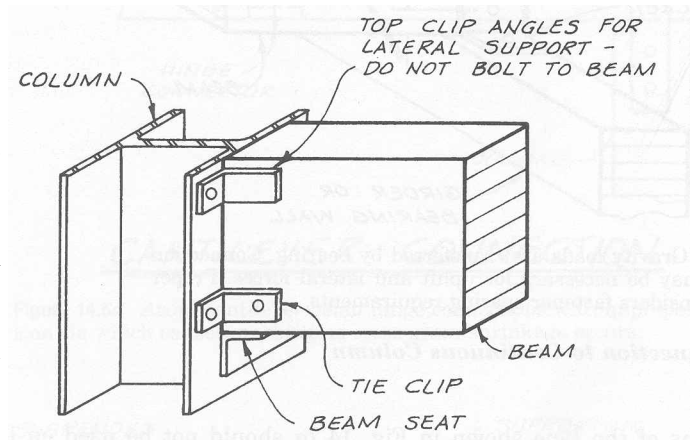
BEAM CONNECTION TO CONTINUOUS COLUMN DETAIL
